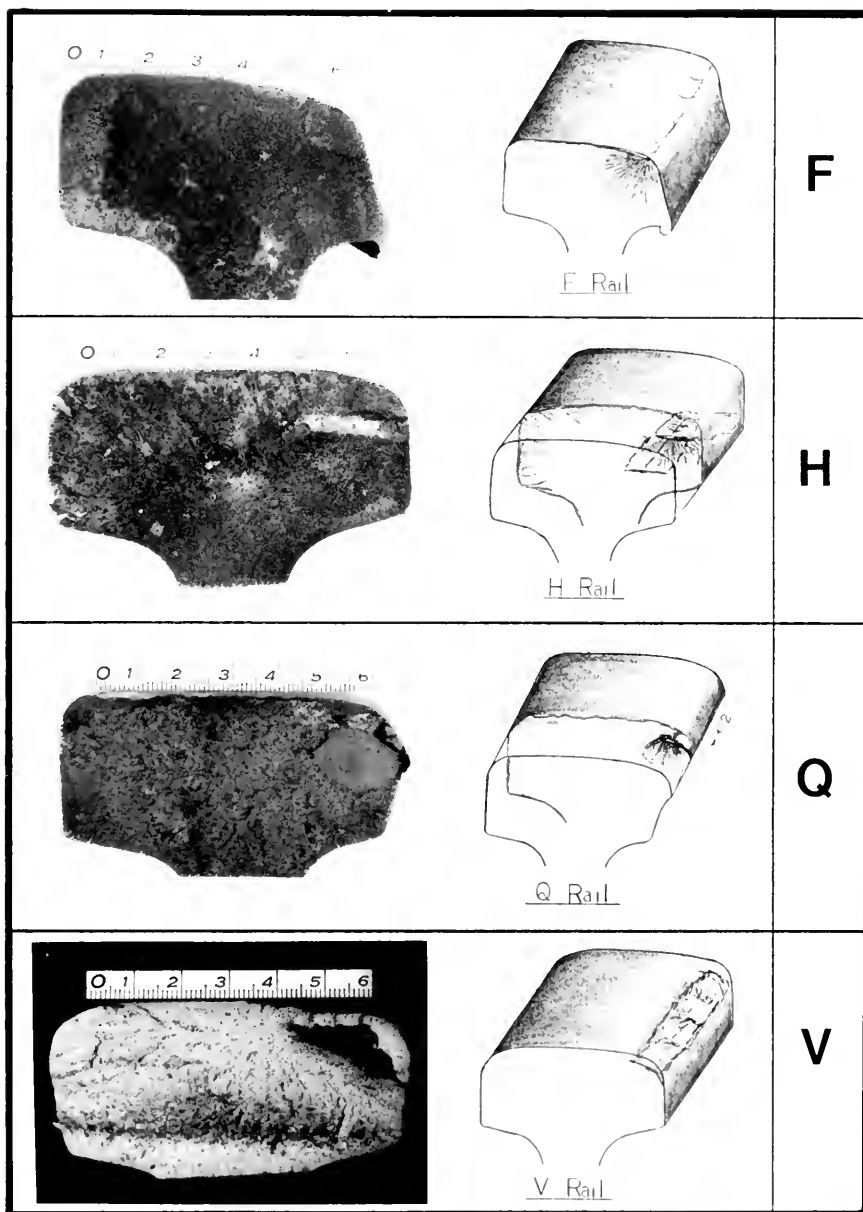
Photographs and Schematics of fracture surface of typical fatigue damaged rail samples
